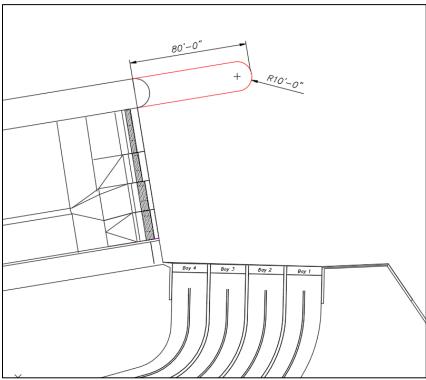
Layout showing the extension of the hardened ramp wall and bullnose.
